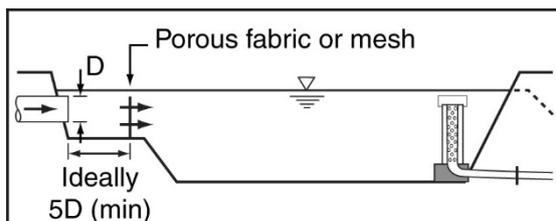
(b) – Typical layout of inlet chamber with opposing inlet pipe (Type C basin)
